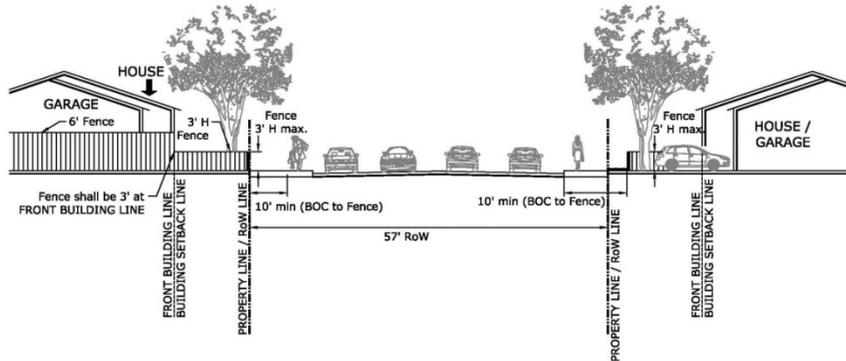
(d) – Typical Cross Section with NO Landscaped Area and Sidewalk
